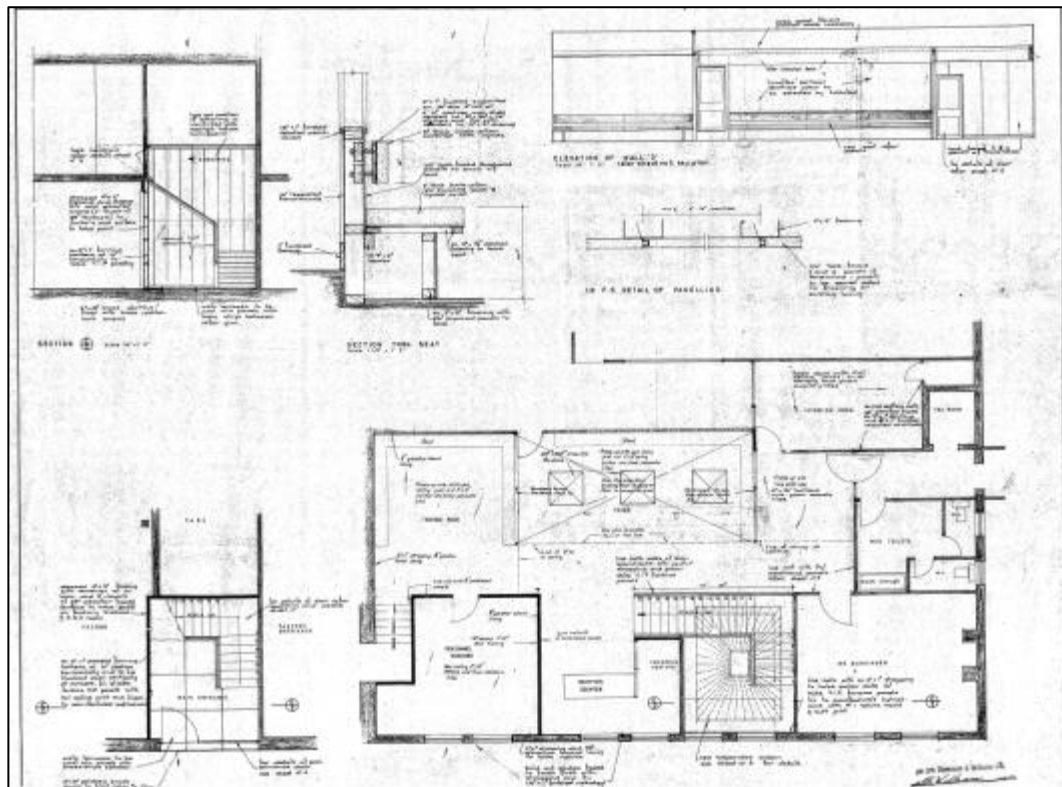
Plans by Stevenson and Williams of 1966 alterations to the first floor offices in the Dairy and Machine House Building (DCC Archives).
